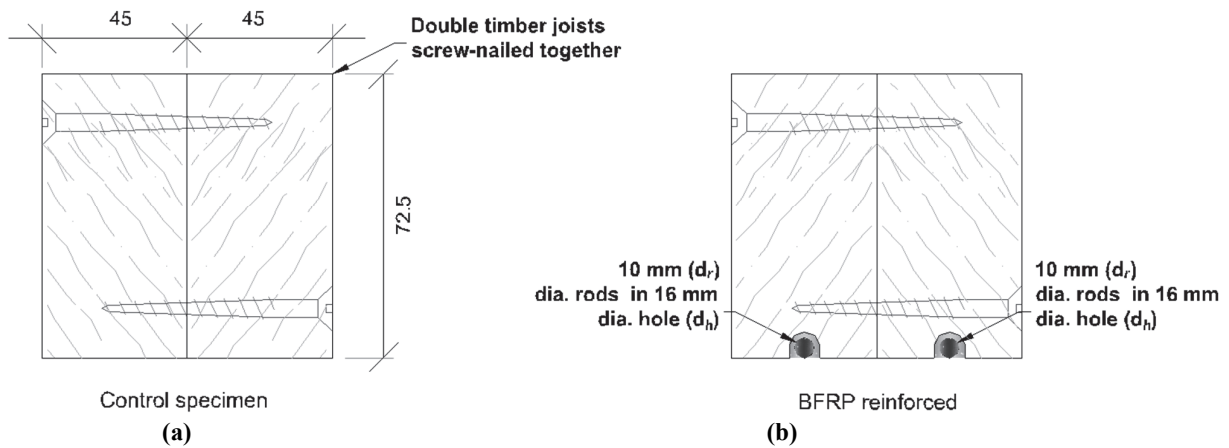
Section arrangement of unreinforced (a) and reinforced beam (b)
